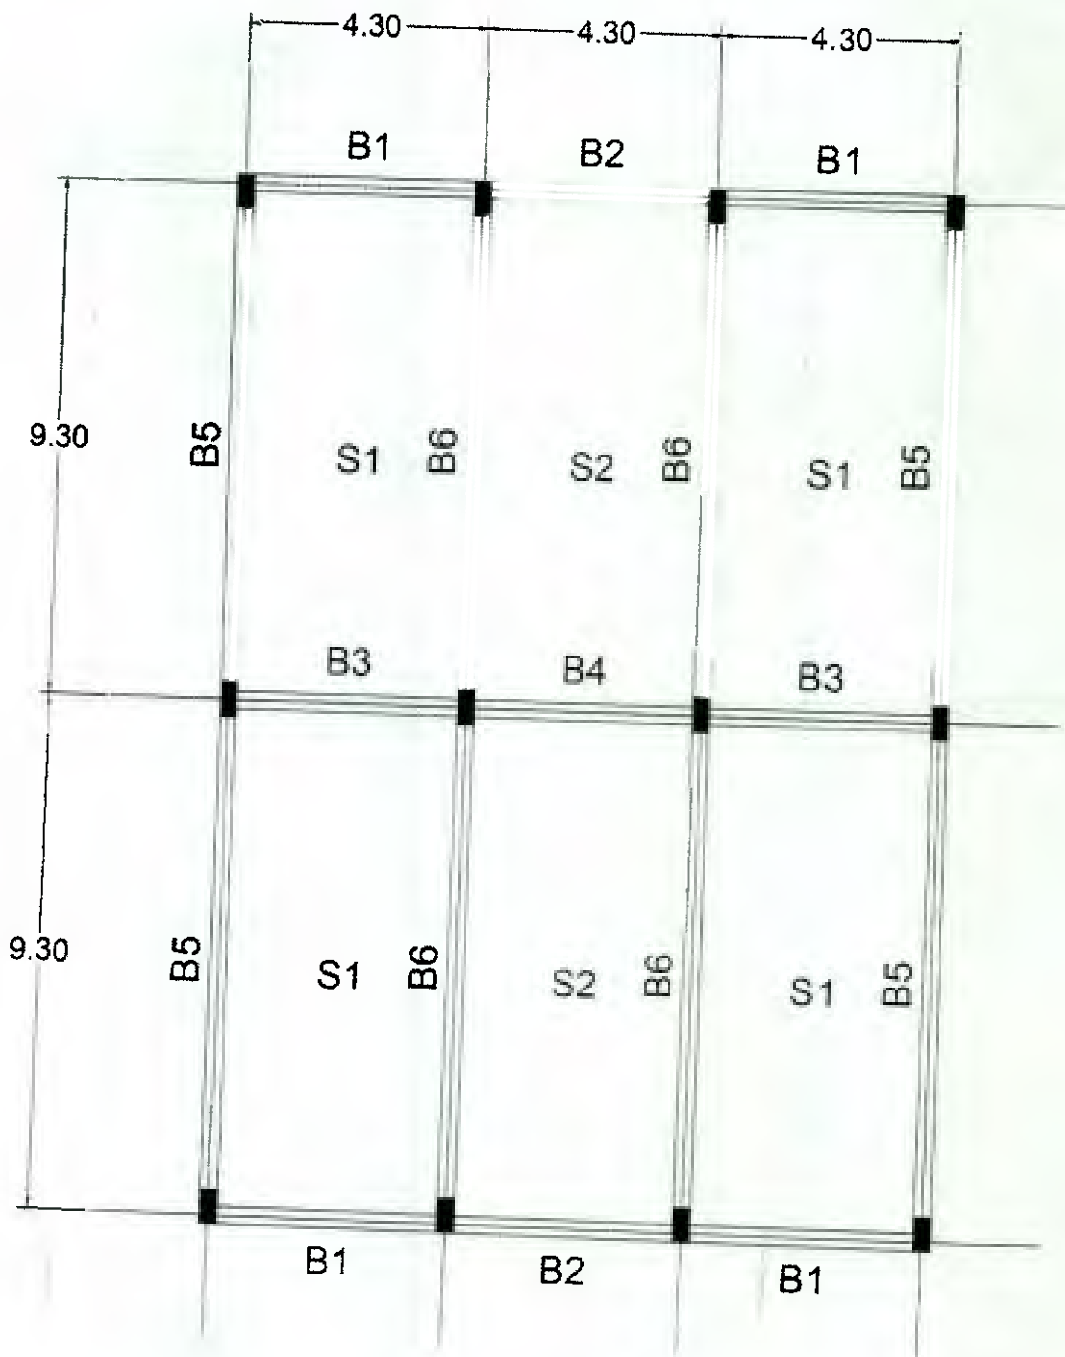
Plan of Flooring System (Note that the beam width is 300 mm)
